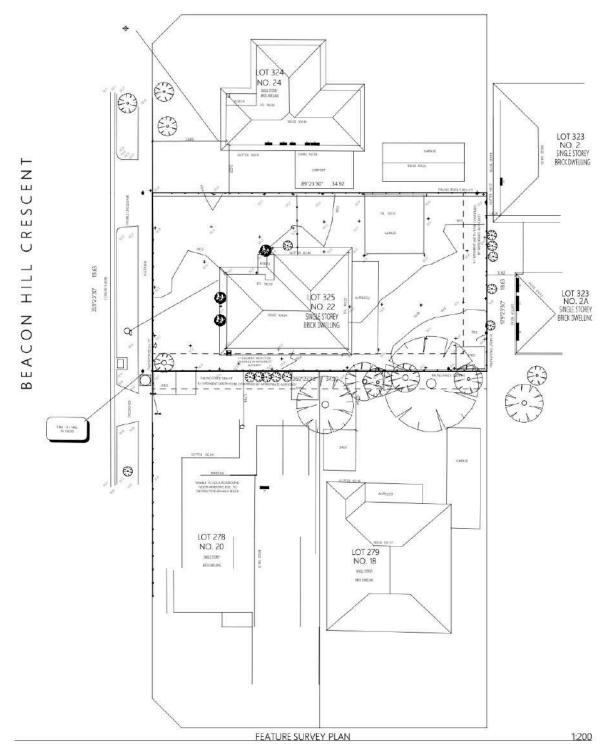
FEATURE SURVEY PLAN LOCATED ON PAGE 4 OF THE PLANS
